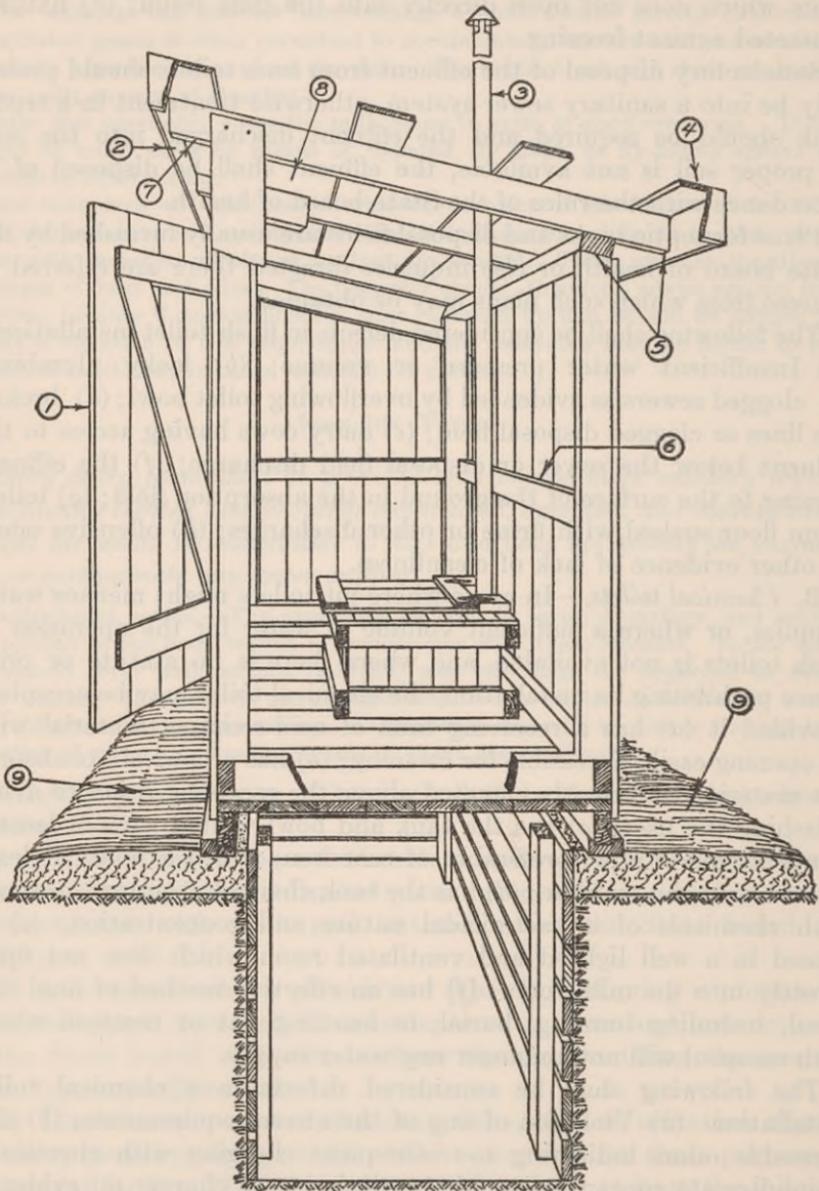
Suggested wood-floor wood-riser pit privy with floor constructed on sills independent of curbing. (From Supplement No. 108, P. H. Reports.)
